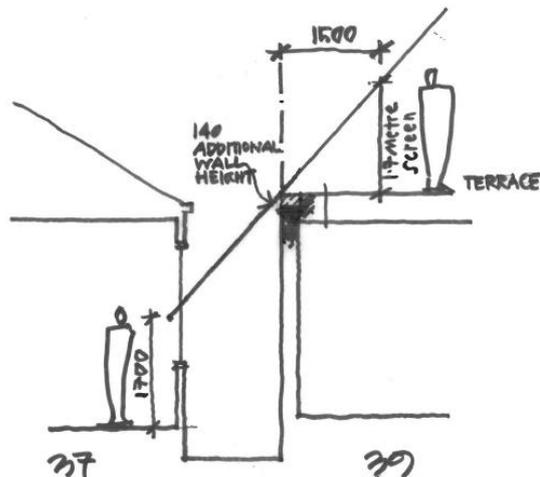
Sketch plan of the north-facing window of No. 37 Delbridge Street and proposed roof terrace screen (submitted 1 July 2021)
